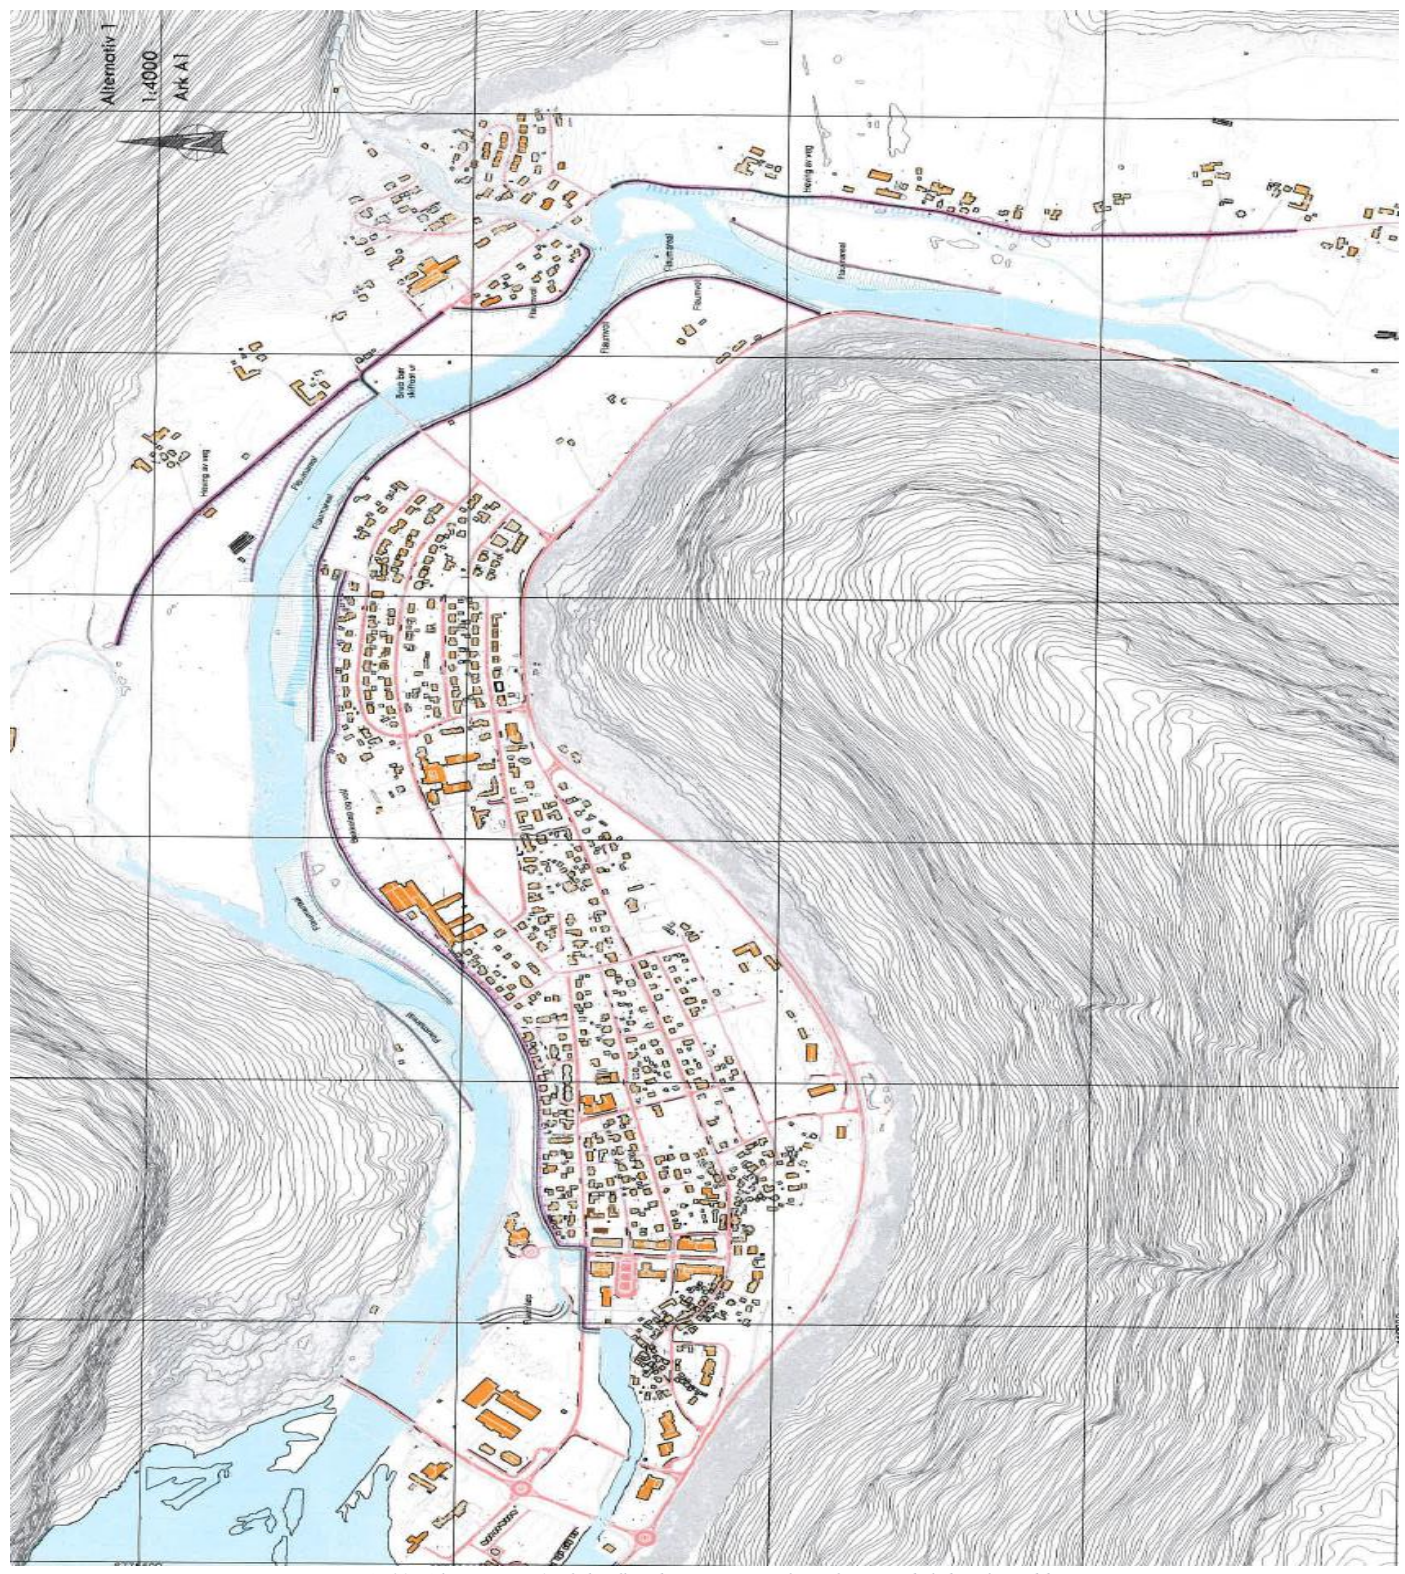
Alternative 1 of the flood protection plans for Lærdal developed by NVE
